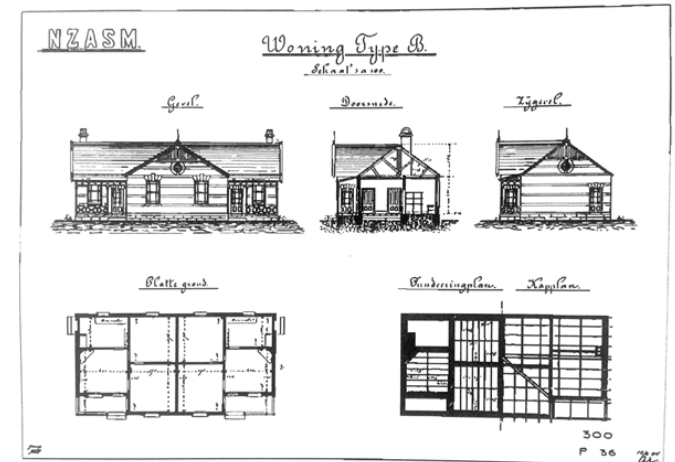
Plan and elevation of Type B semi-detached cottage, NZASM dated 12 June 1894 (De Jong 1990:56)
